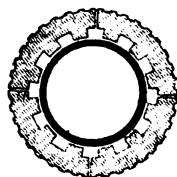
Ribbed-tile Protection. Cylindrical Column
